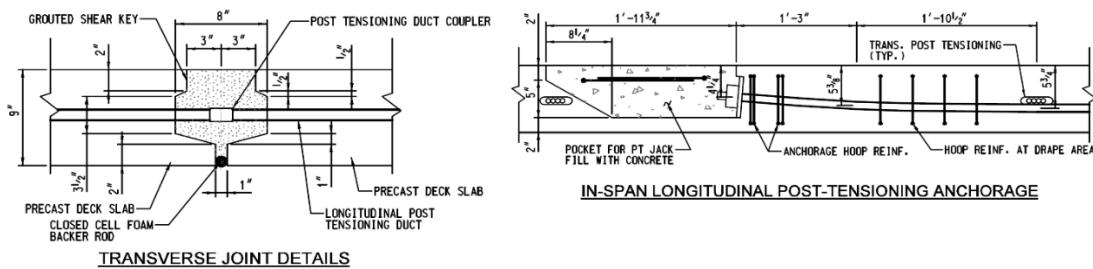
Deck-to-deck connection detail with post-tensioning, first used in 1997.
